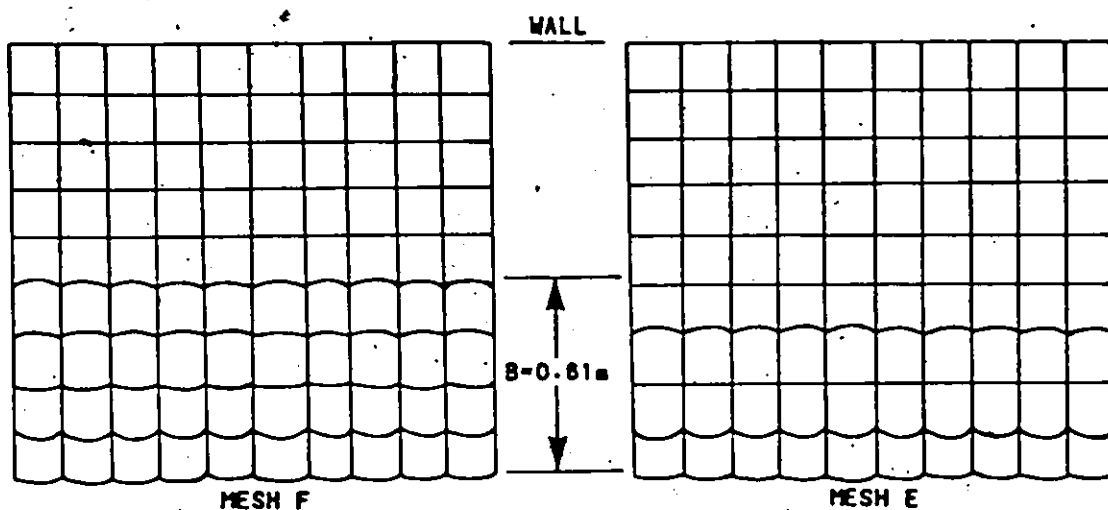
DEFORMATION OF UPPER REINFORCING MESH LAYERS AFTER LOAD TEST (REINFORCED WALL W-4)
